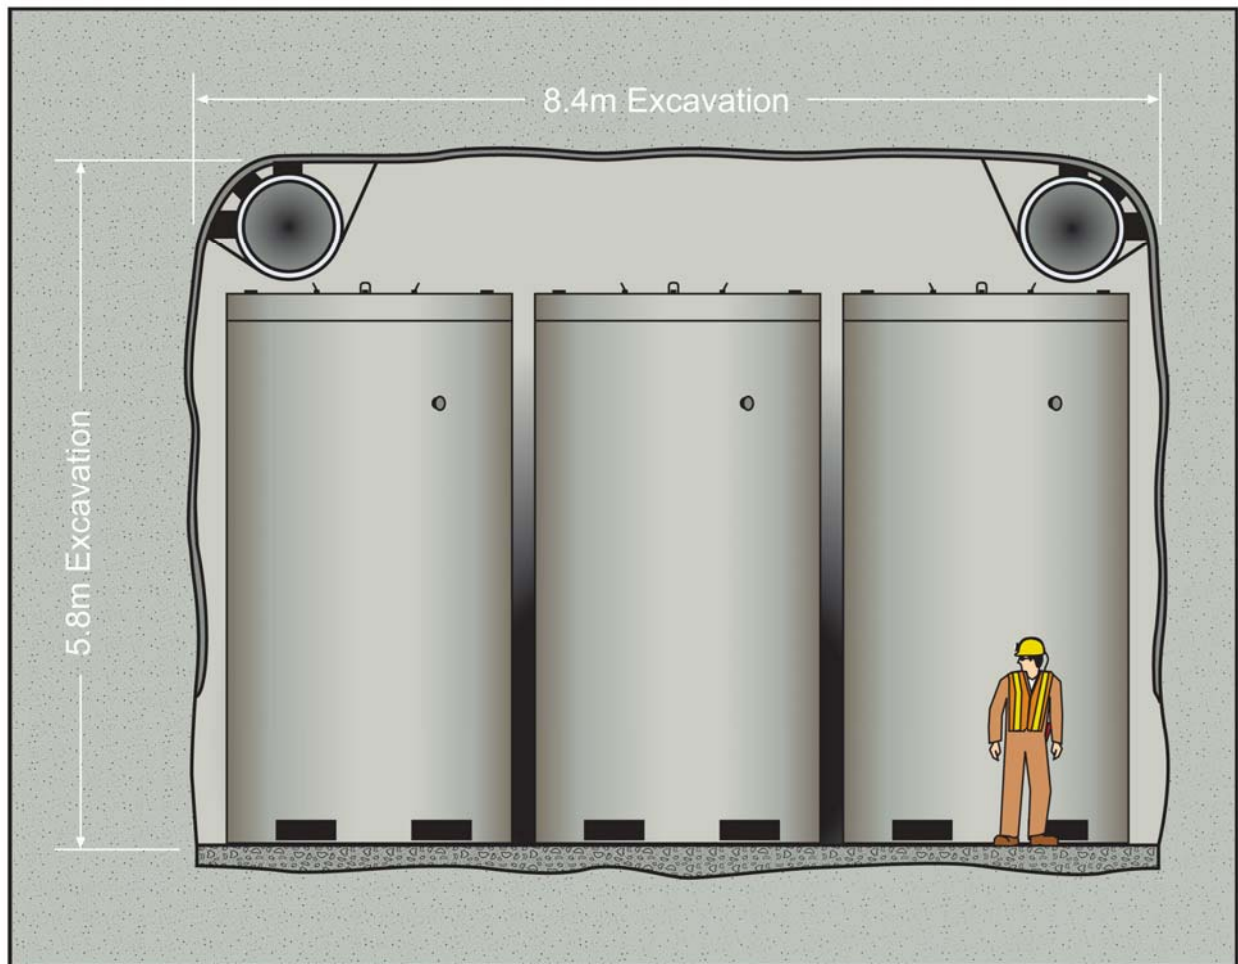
Emplacement Room Section View – P3 Profile for Resin Liner Type Waste Packages
